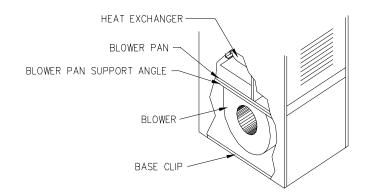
Cutaway view of fan section of a typical highboy furnace.
